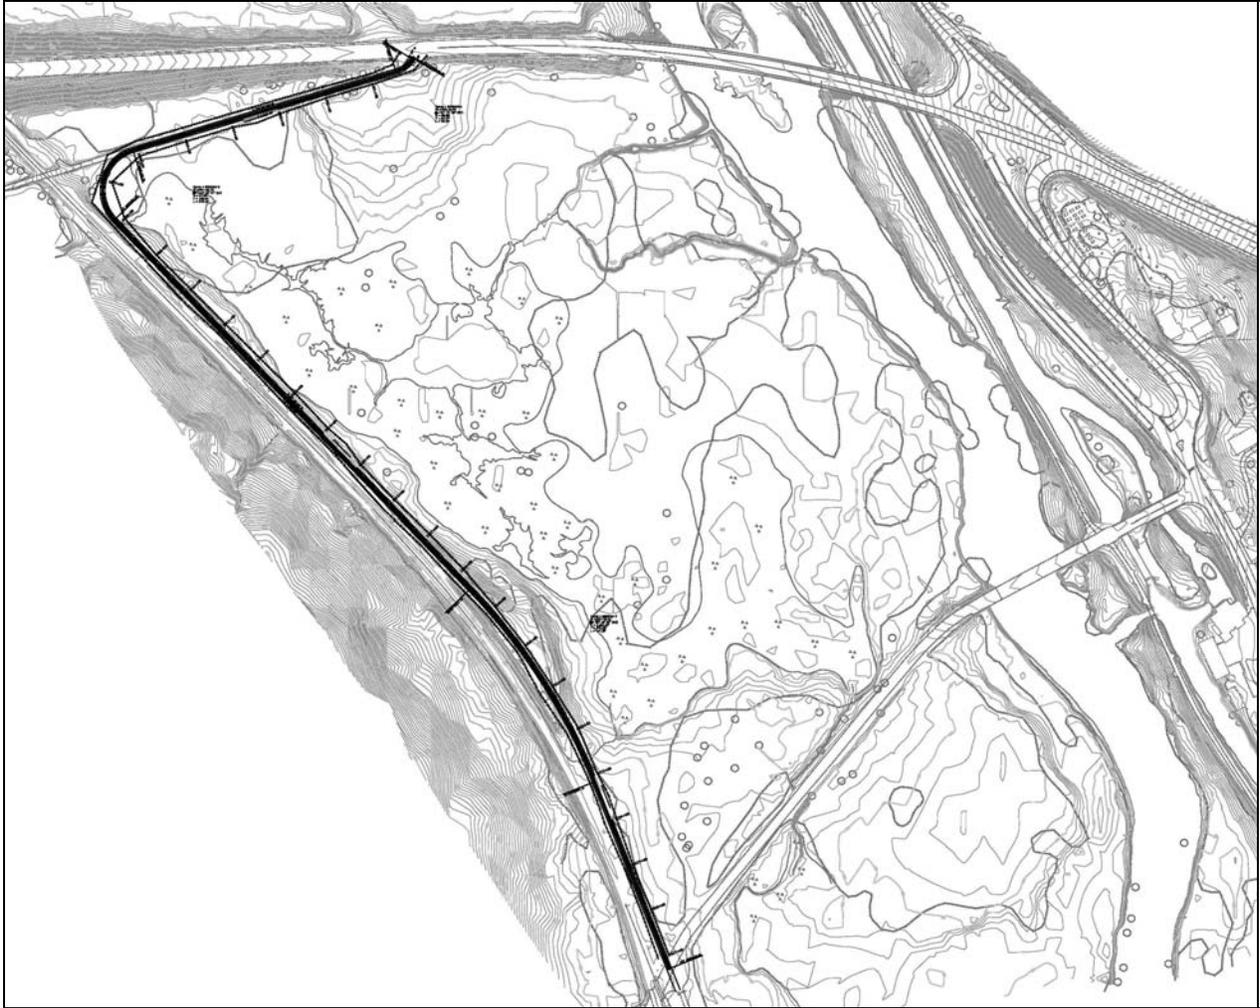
The approximate location of the access route is shown following the existing sewer access road and rail line to provide necessary access to the maintenance yard.
